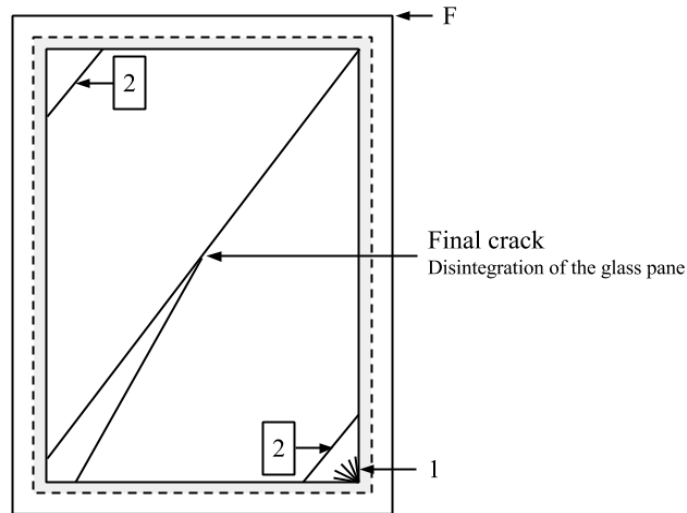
Crack pattern for glass fastened with double lap joint: (1) First crack, (2) Second crack and (3) Final crack (Huveners, 2009)
